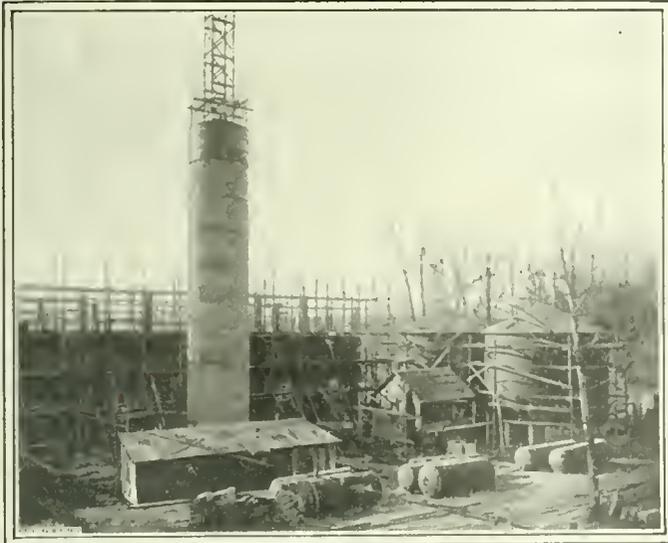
WATER PURIFYING PLANT, STACK, AND BOILER HOUSE
